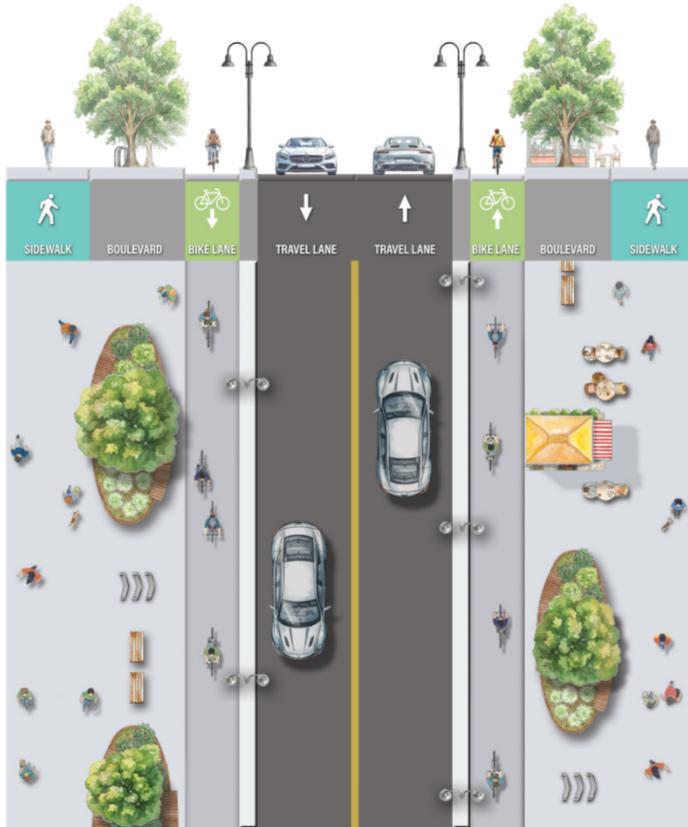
Standard Oak Street Section/Plan view, 24 m width
